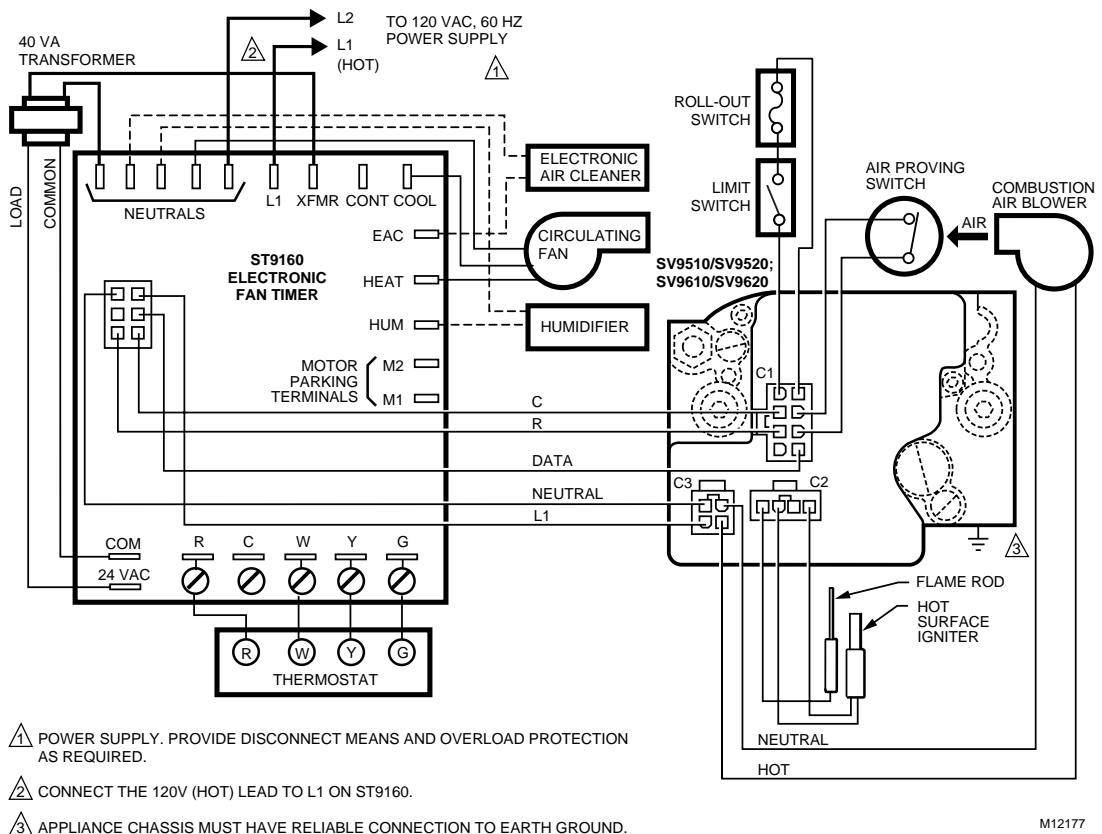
Typical ST9160 wiring connections with SV9510/SV9520; SV9610/SV9620 SmartValve System Control.
